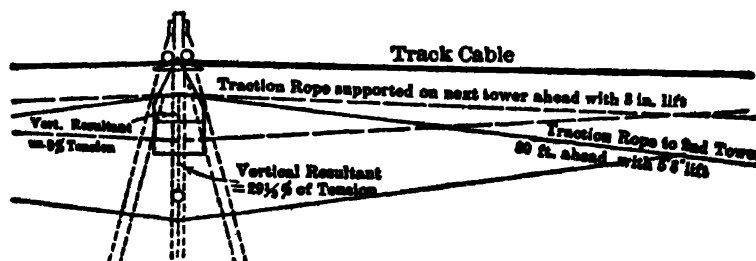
Stresses in Saddle Beams; Towers 40 ft Apart; Cable Deflected 5% on Each
